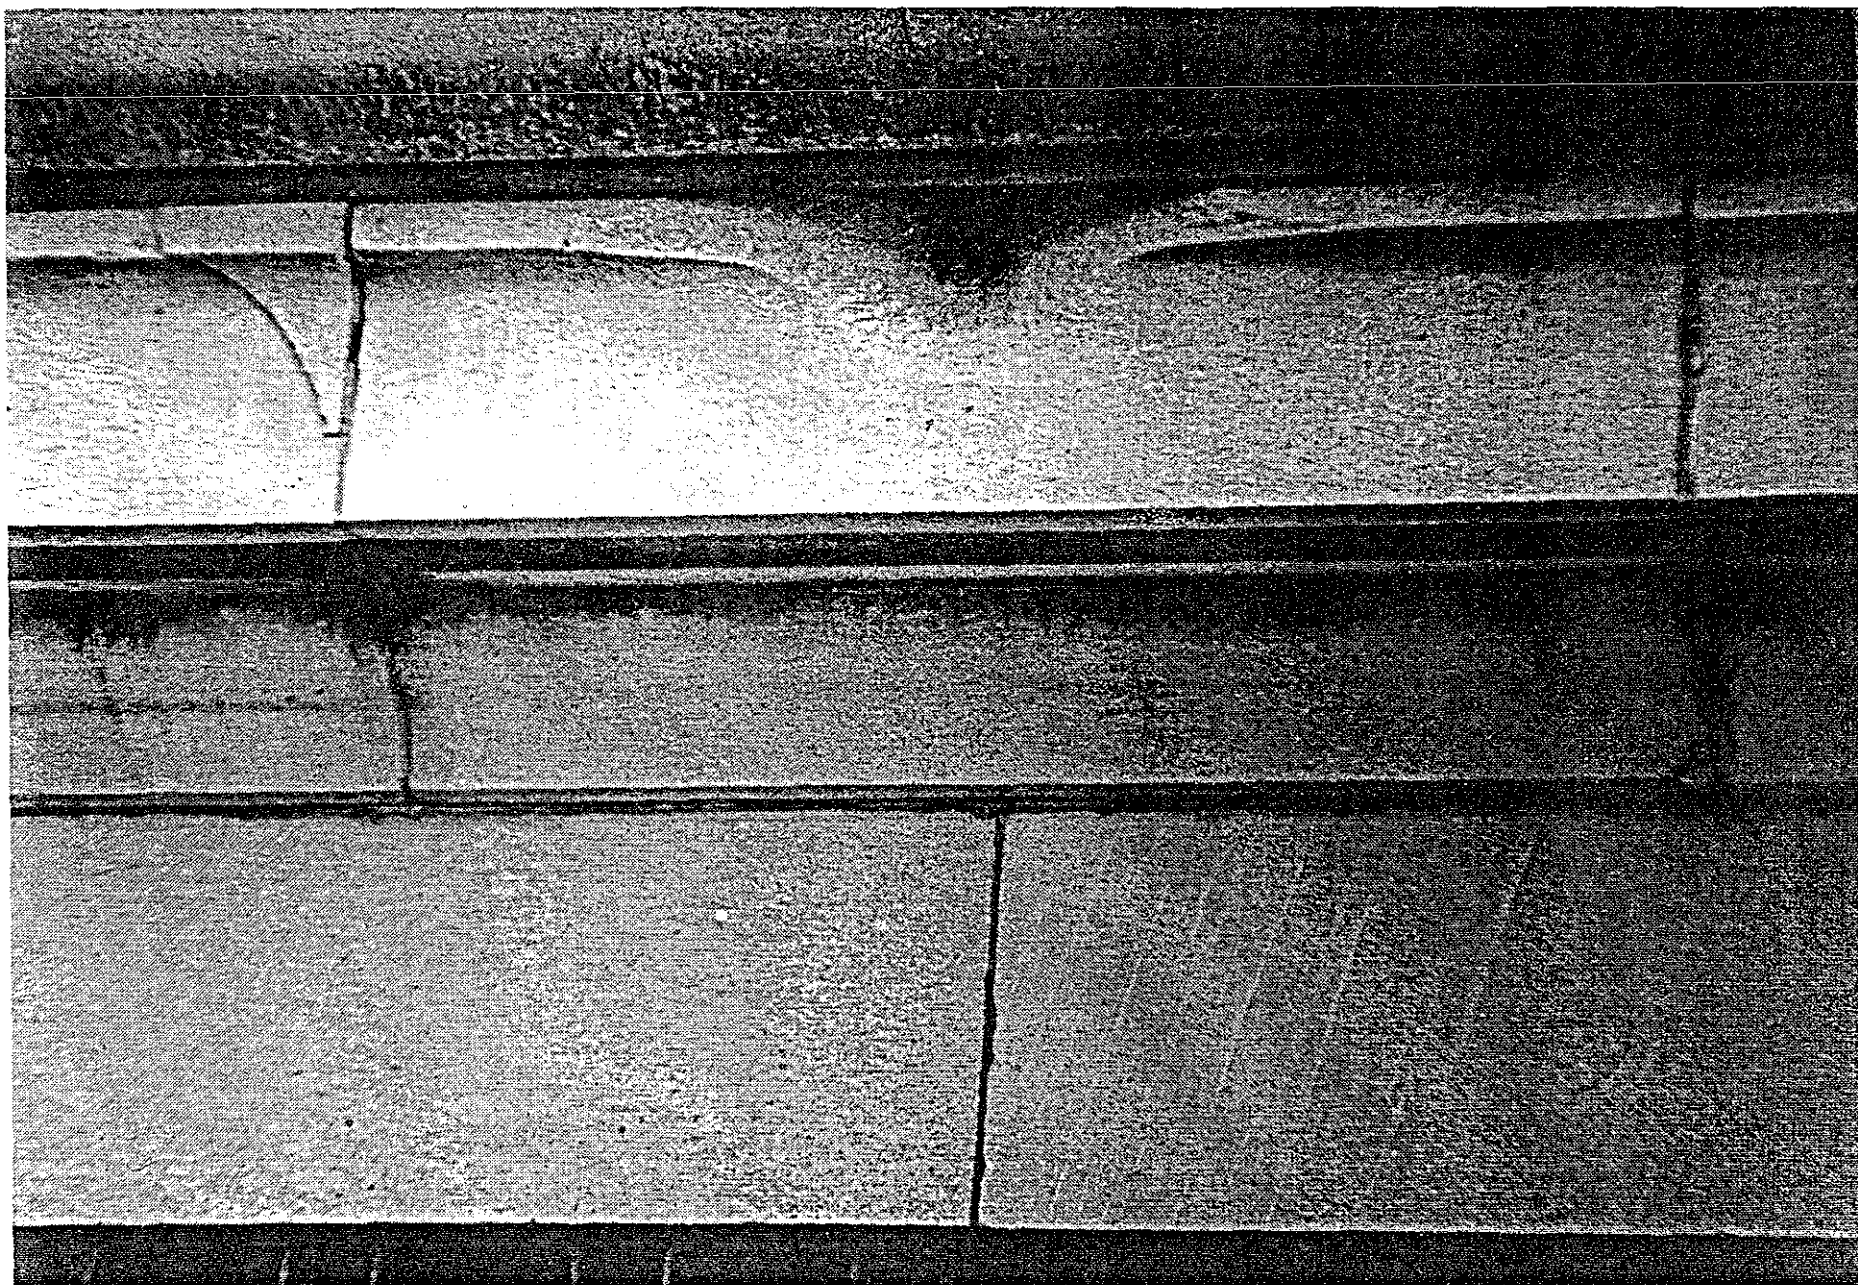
Spalled stone fascia along eaves at southeast corner of roof.
